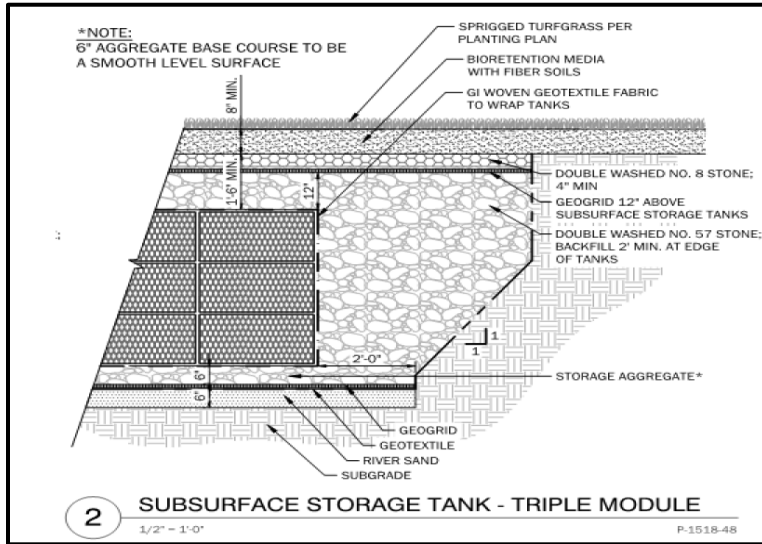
Van McMurray Park Proposed Cross Section Drainage and Storage Tank
